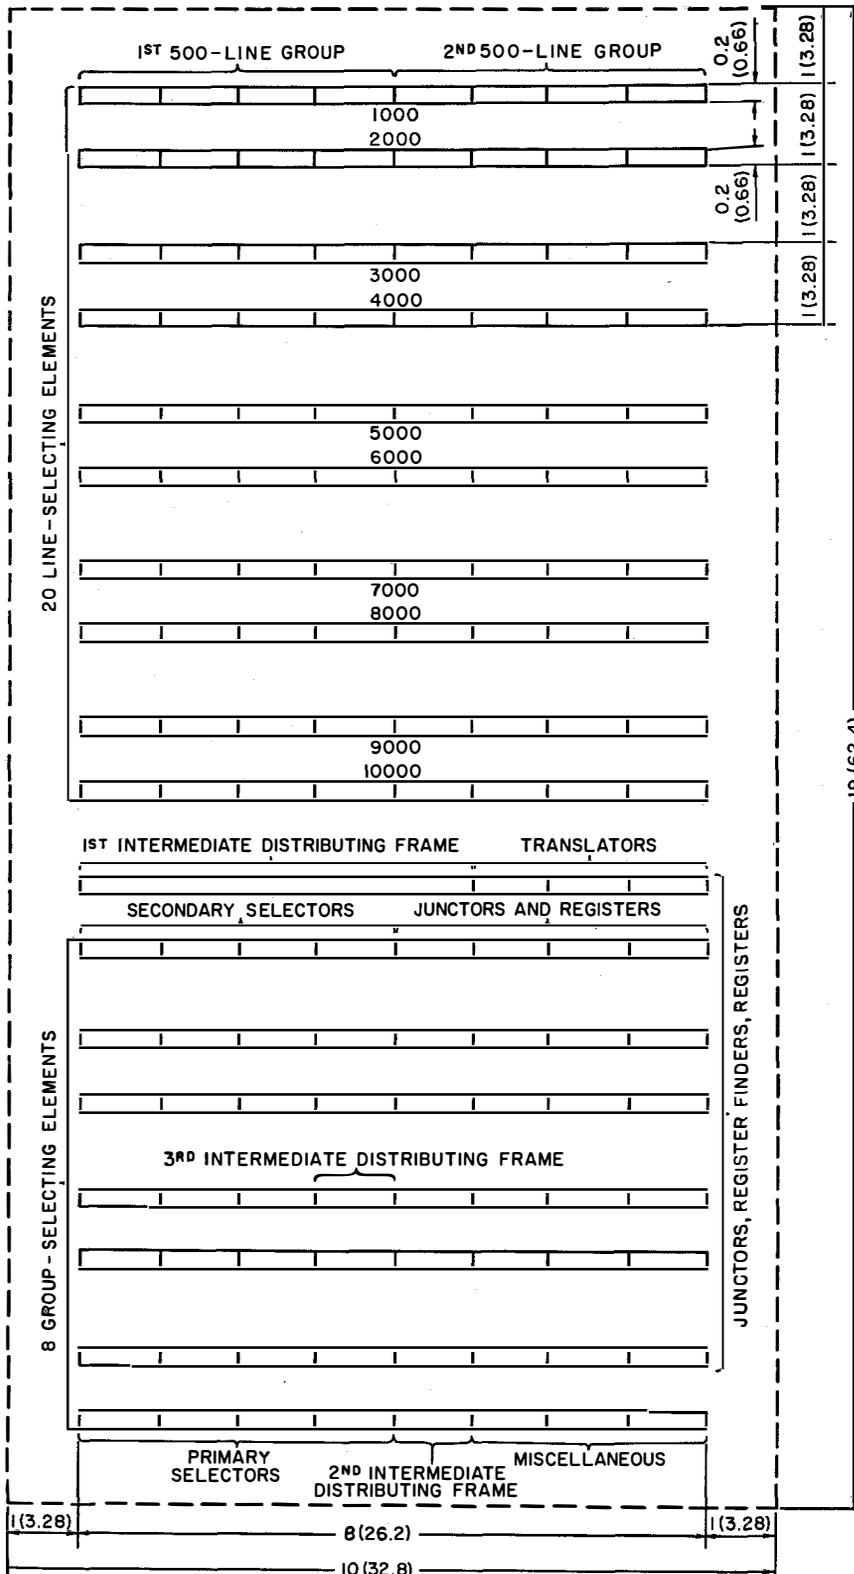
Typical layout of a 10,000-line exchange switch room. All bays are 3.45 meters (11.3 feet) high and minimum ceiling clearance should be 3.9 meters (12.7 feet). Other dimensions are given in meters (feet).
